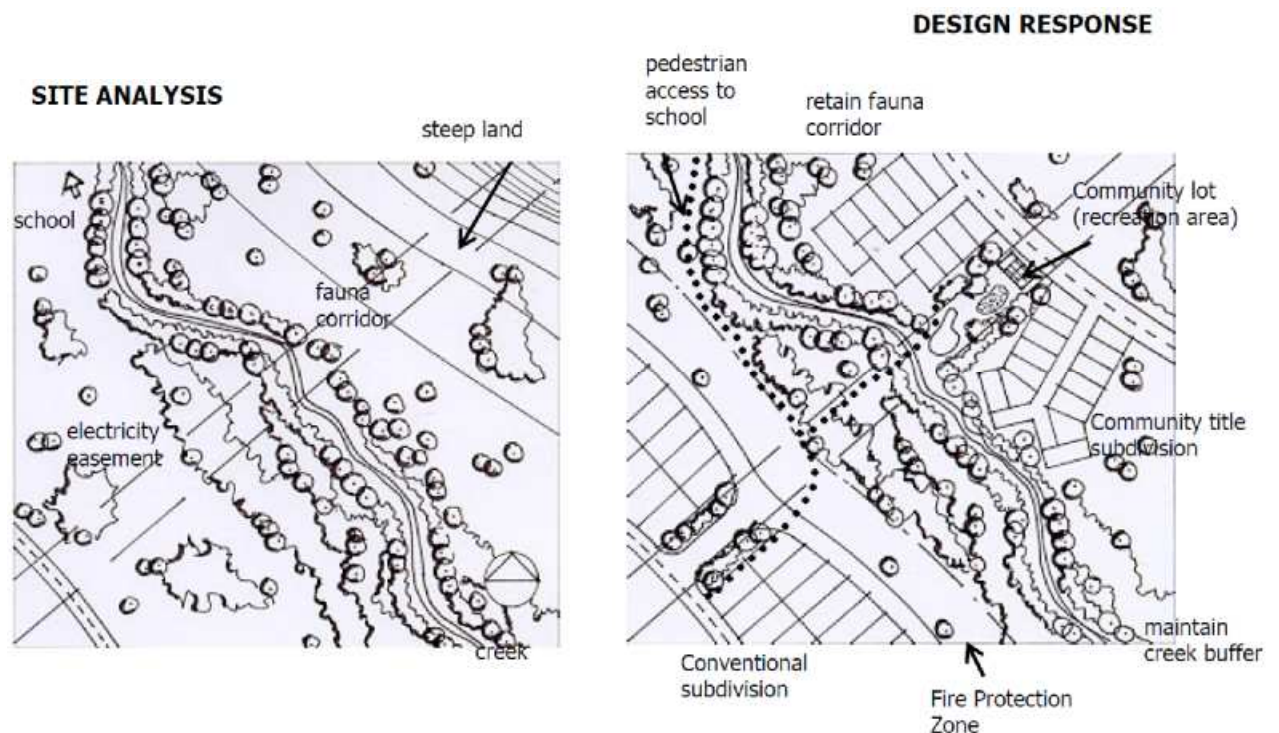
Example of a subdivision design (right) having regard to the site analysis plan (left)
